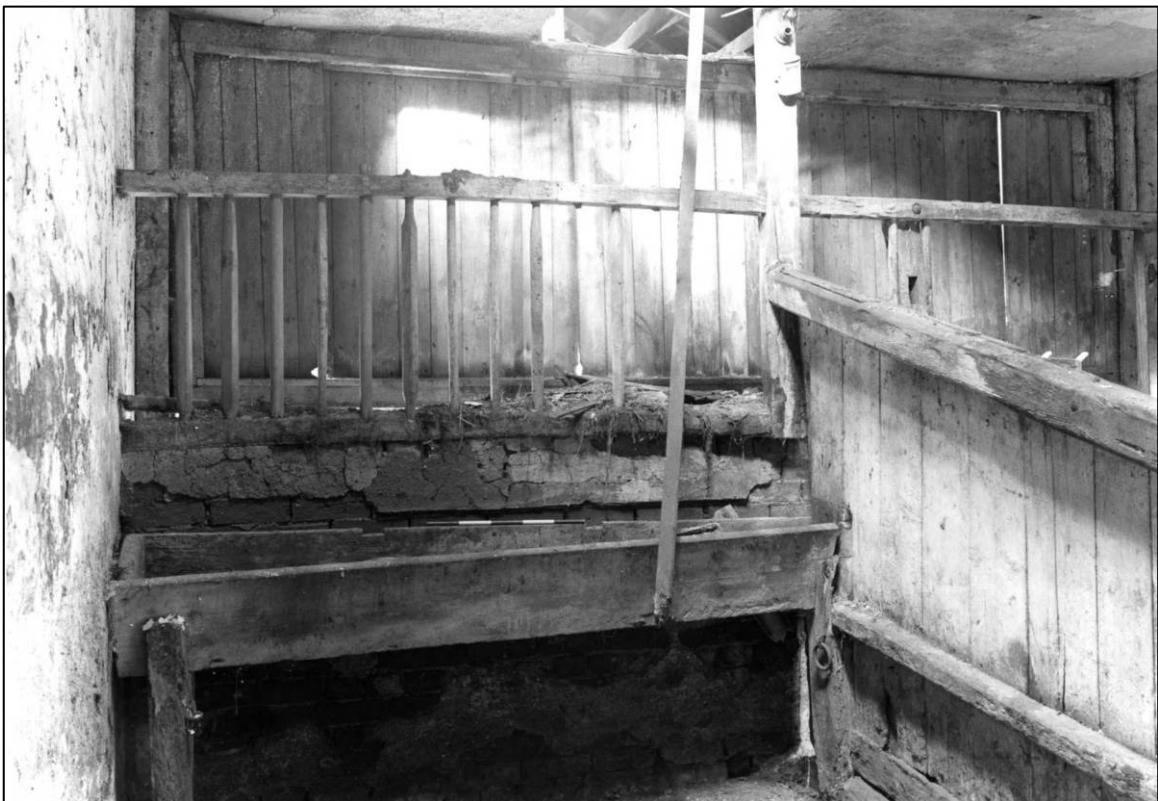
West coach house and stable range, S cell, W stall, looking N (photo 2/2).
